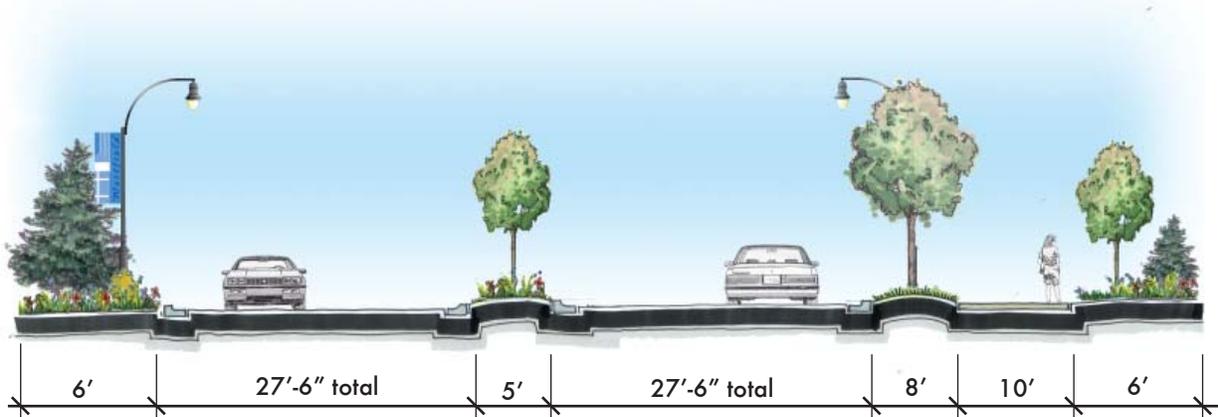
The ideal parkway cross section contains a 90' right-of-way.
